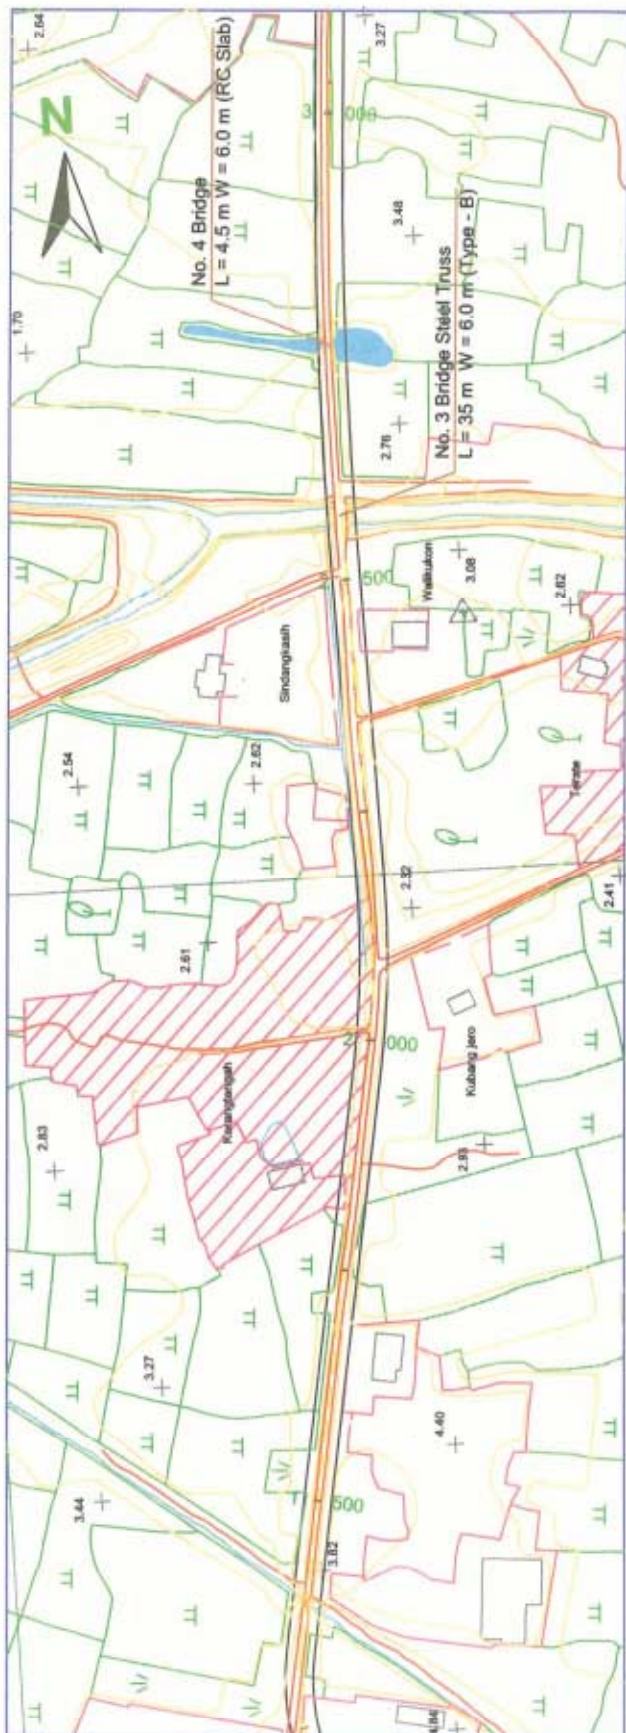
C-13 Bojonegara National Road Plan and Profile (8)
